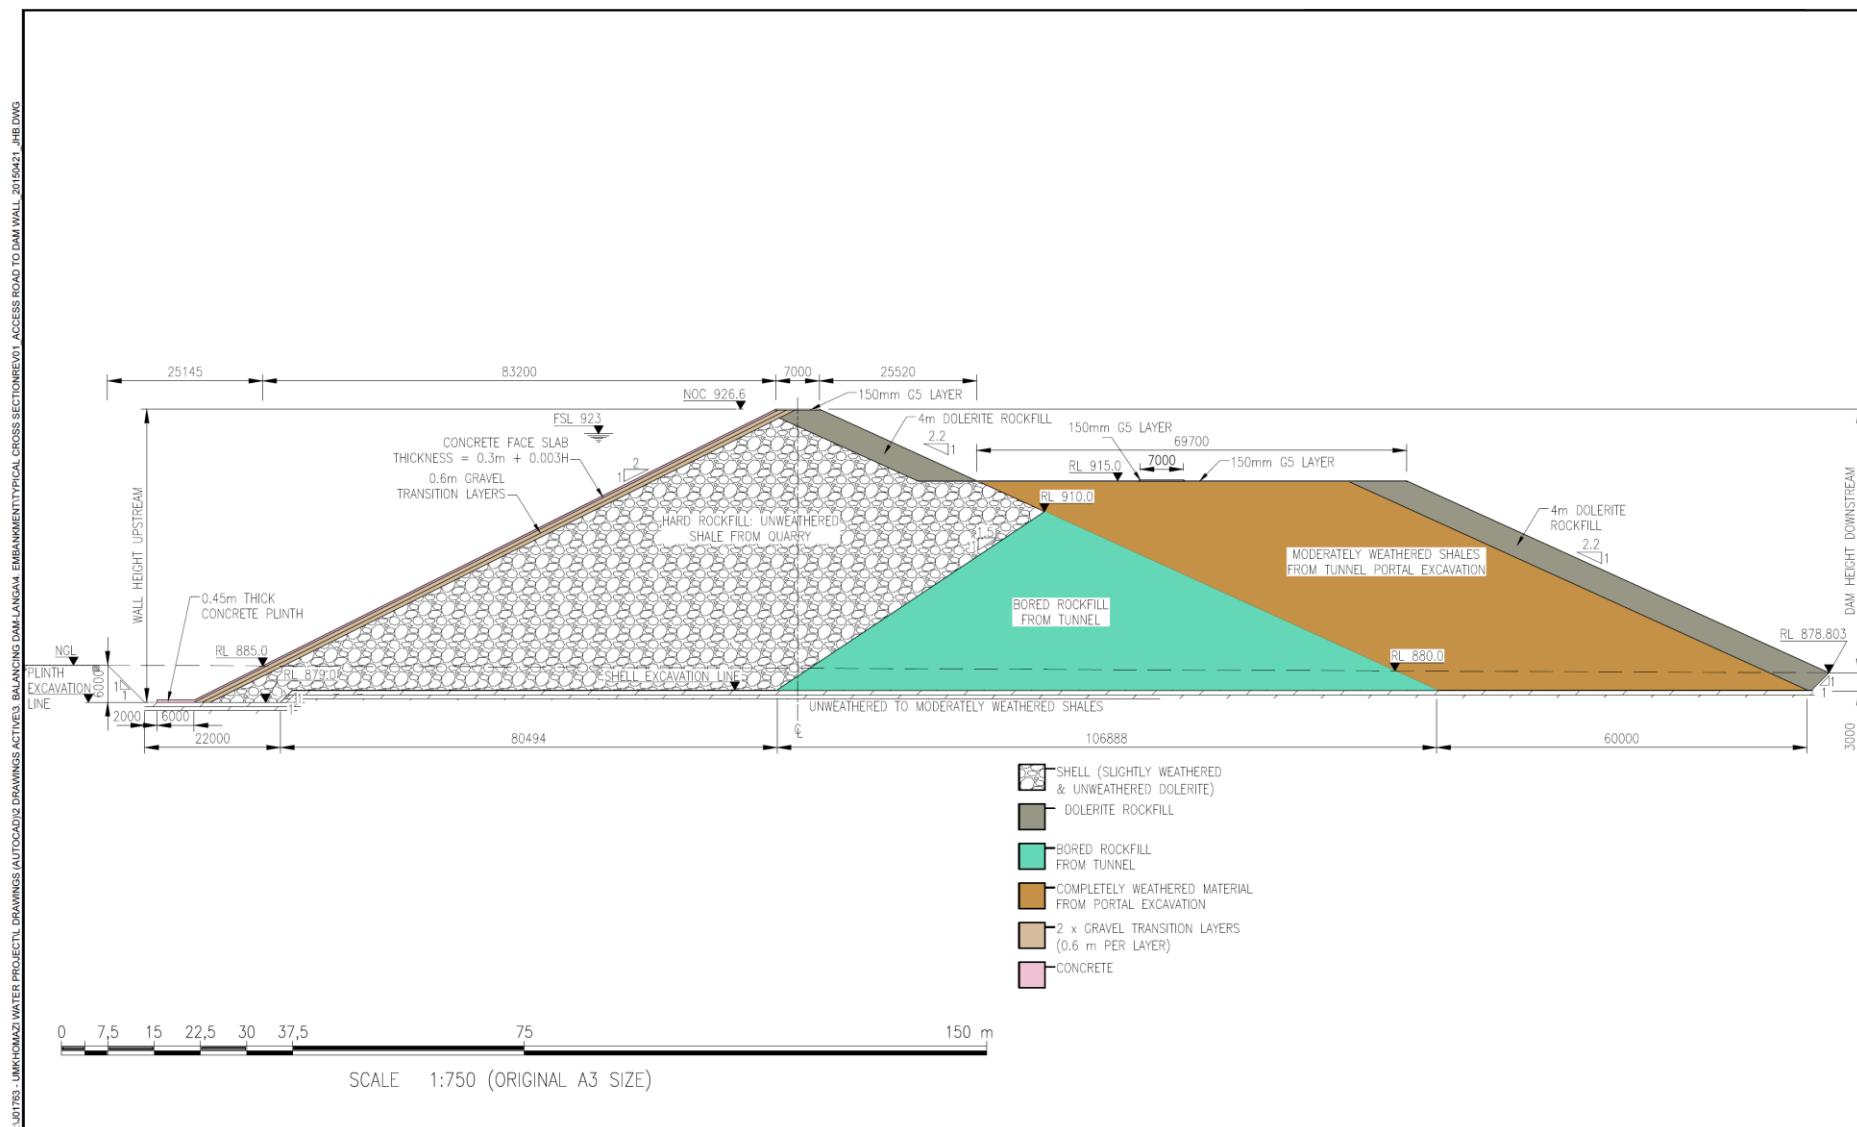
A.2: Langa Dam proposed embankment cross section with dolerite downstream protection layer
